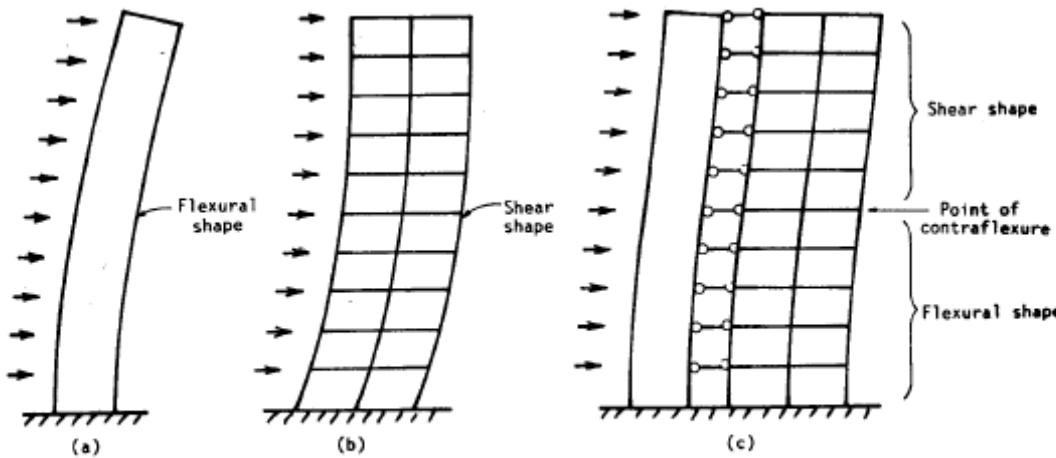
Interaction of shear wall - frame structure and behavior of components.
